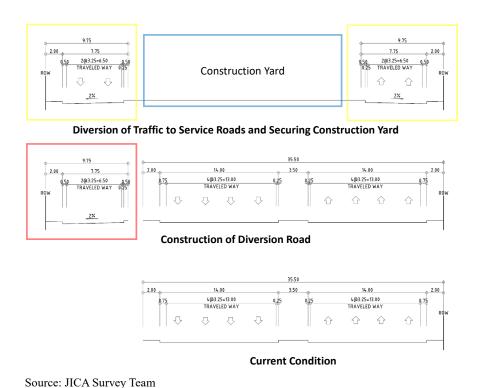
Elevation/profile of the Service Road and the Causeway Construction Yard
